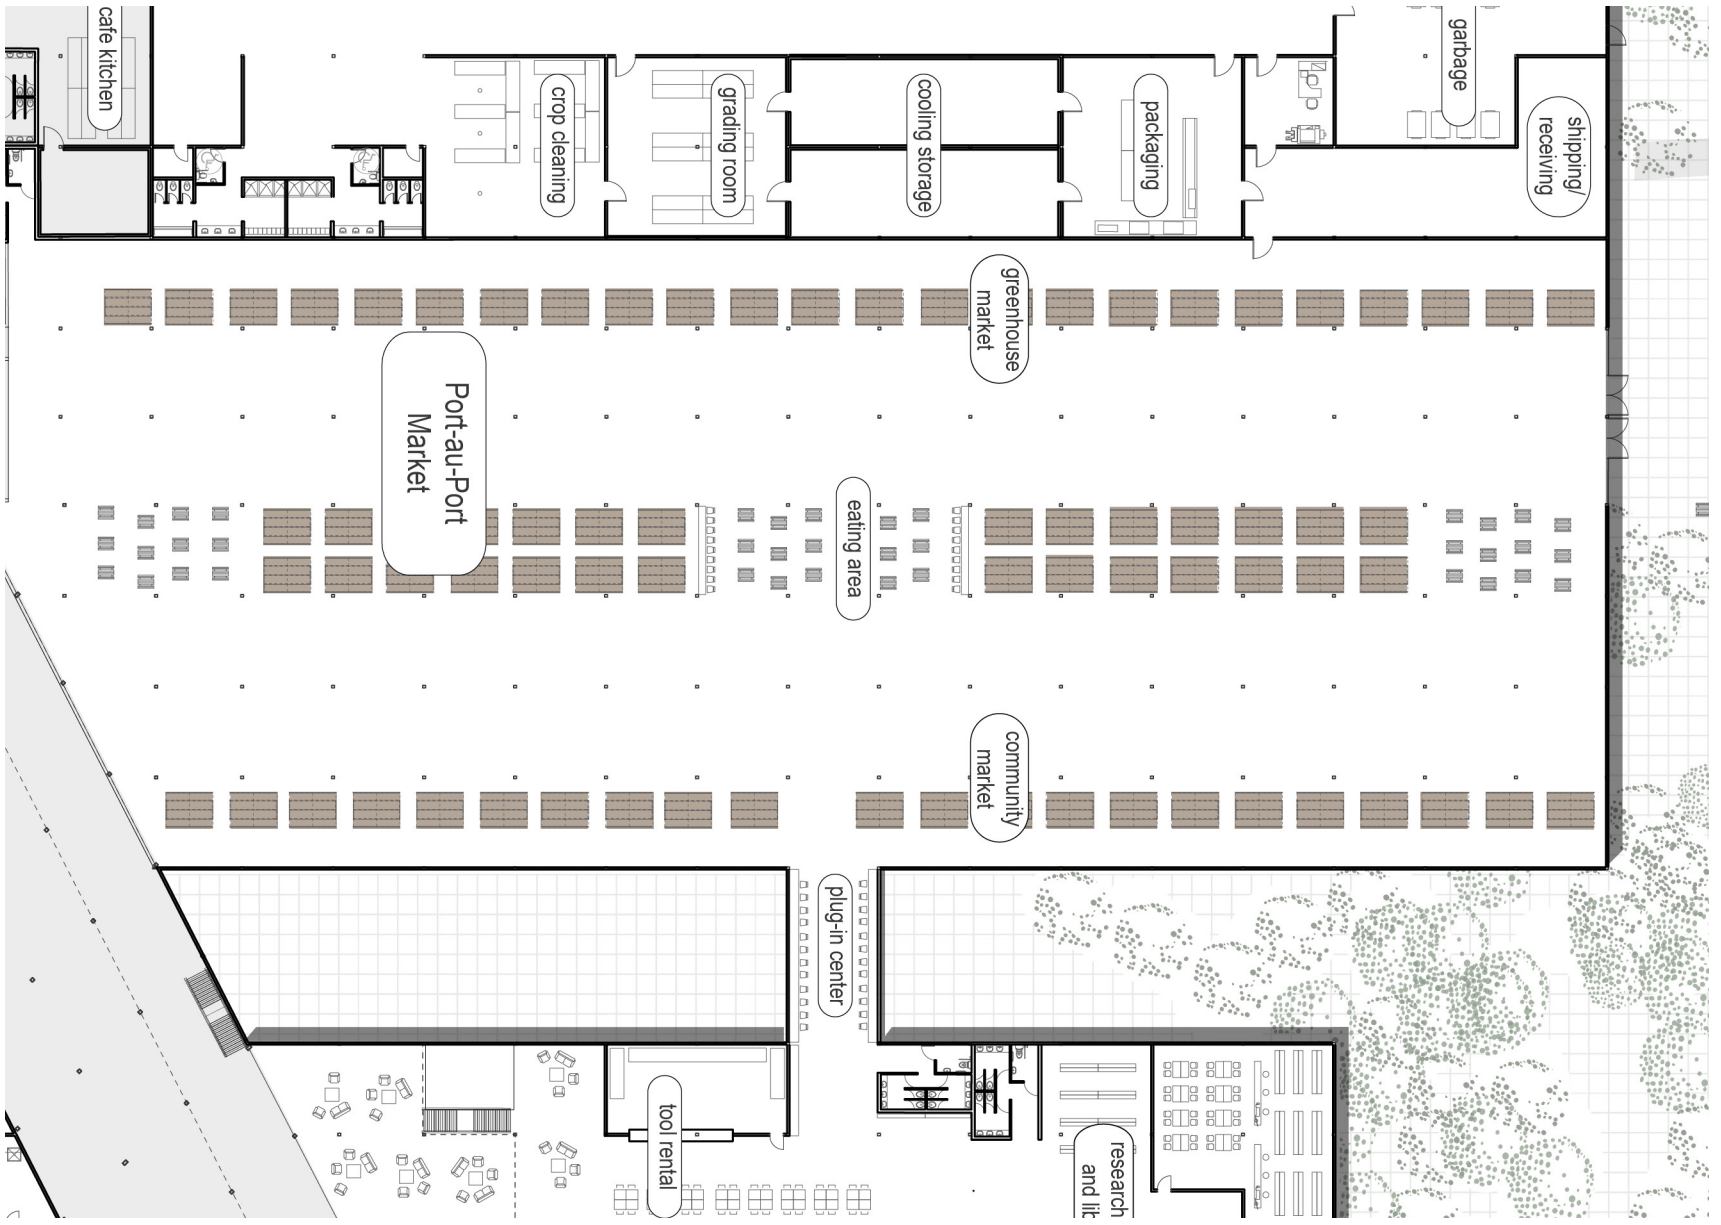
Bottling Station, Innovation Center and Market Plan , 1:500
